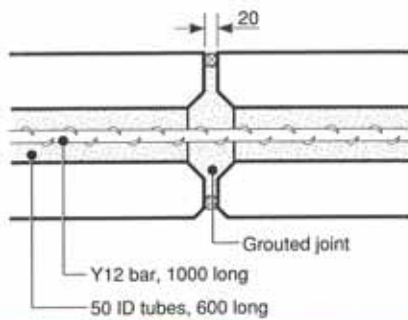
VERTICAL JOINT USING DOWELS OVERLAPPING BARS
